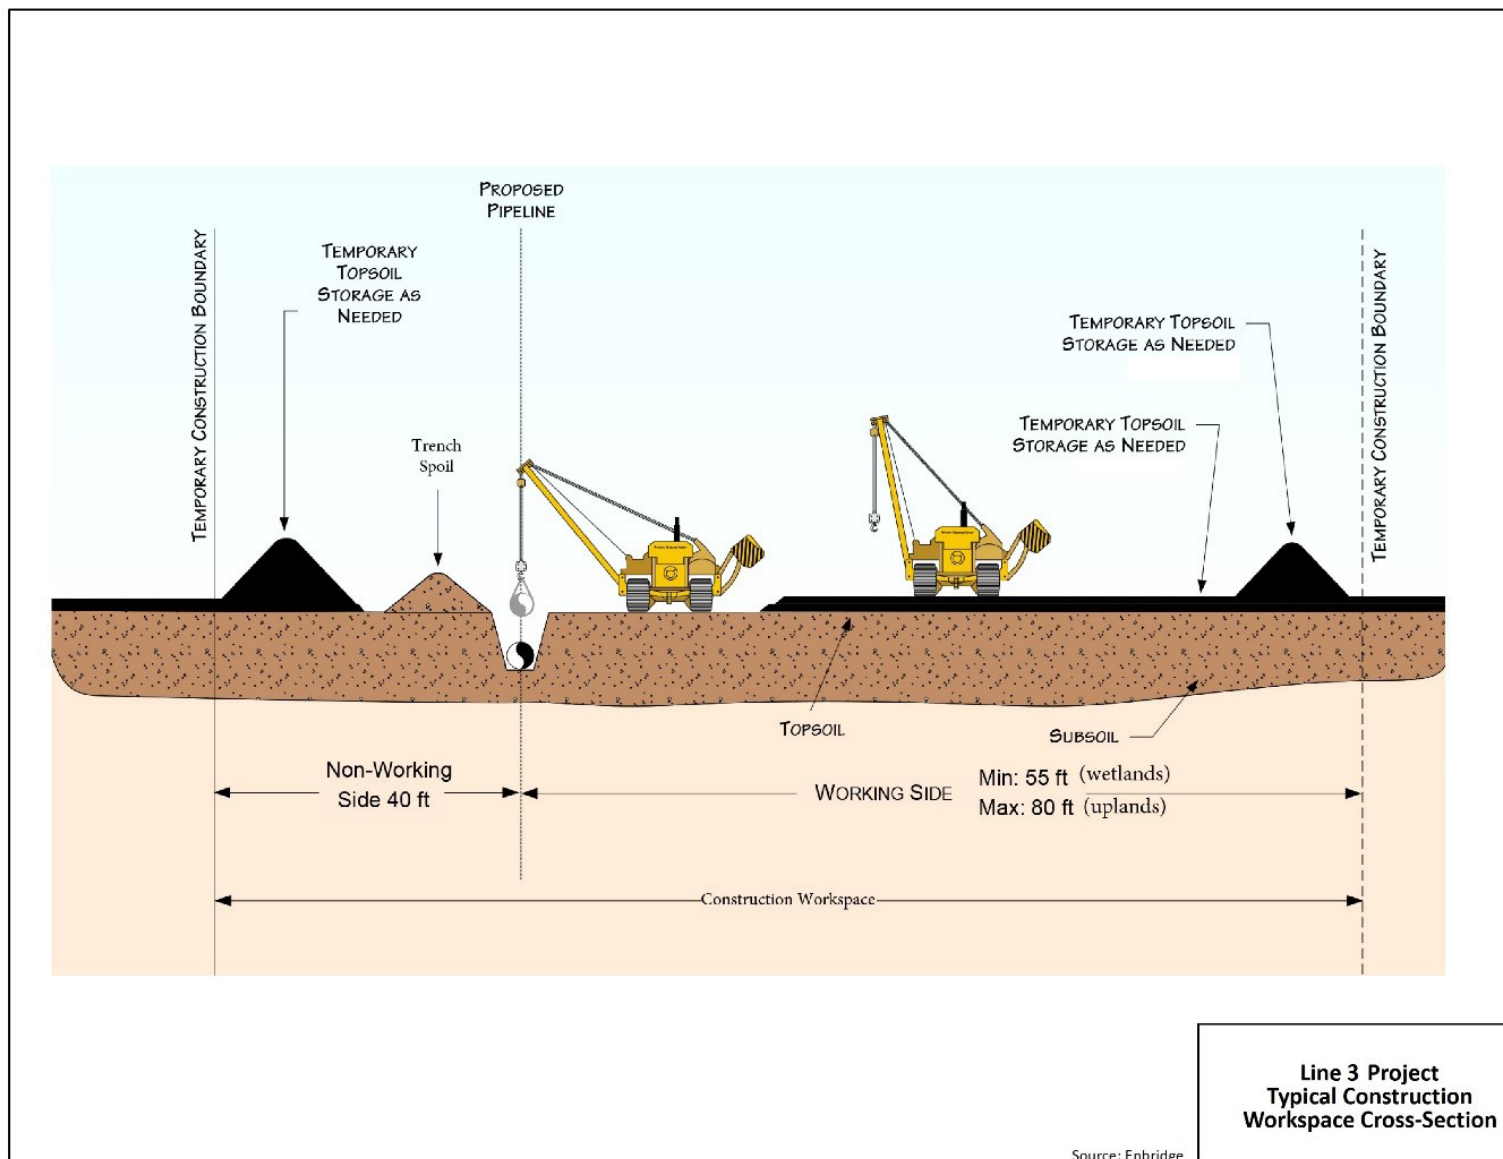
Typical Construction Cross-Section Adjacent to Line 67 or Where No Adjacent Facilities Occur
